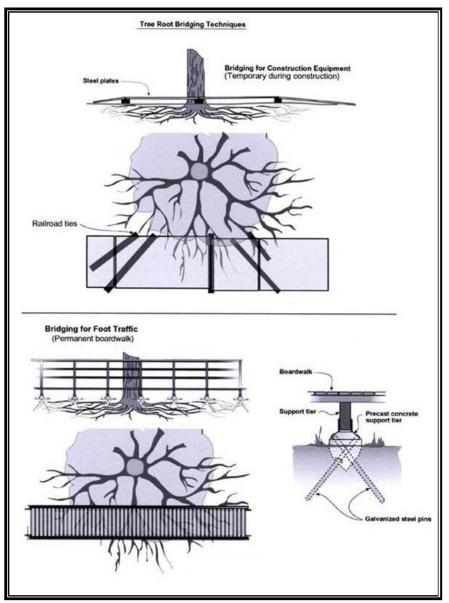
Root Bridge, Source: Pierce County Stormwater Management Manual
